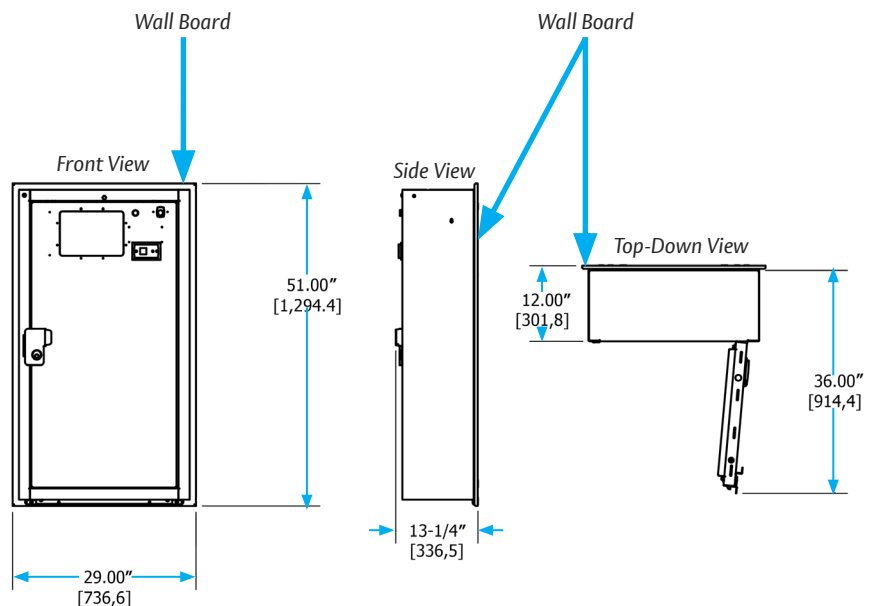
Typical wall-mounted cabinet dimensions agreement
